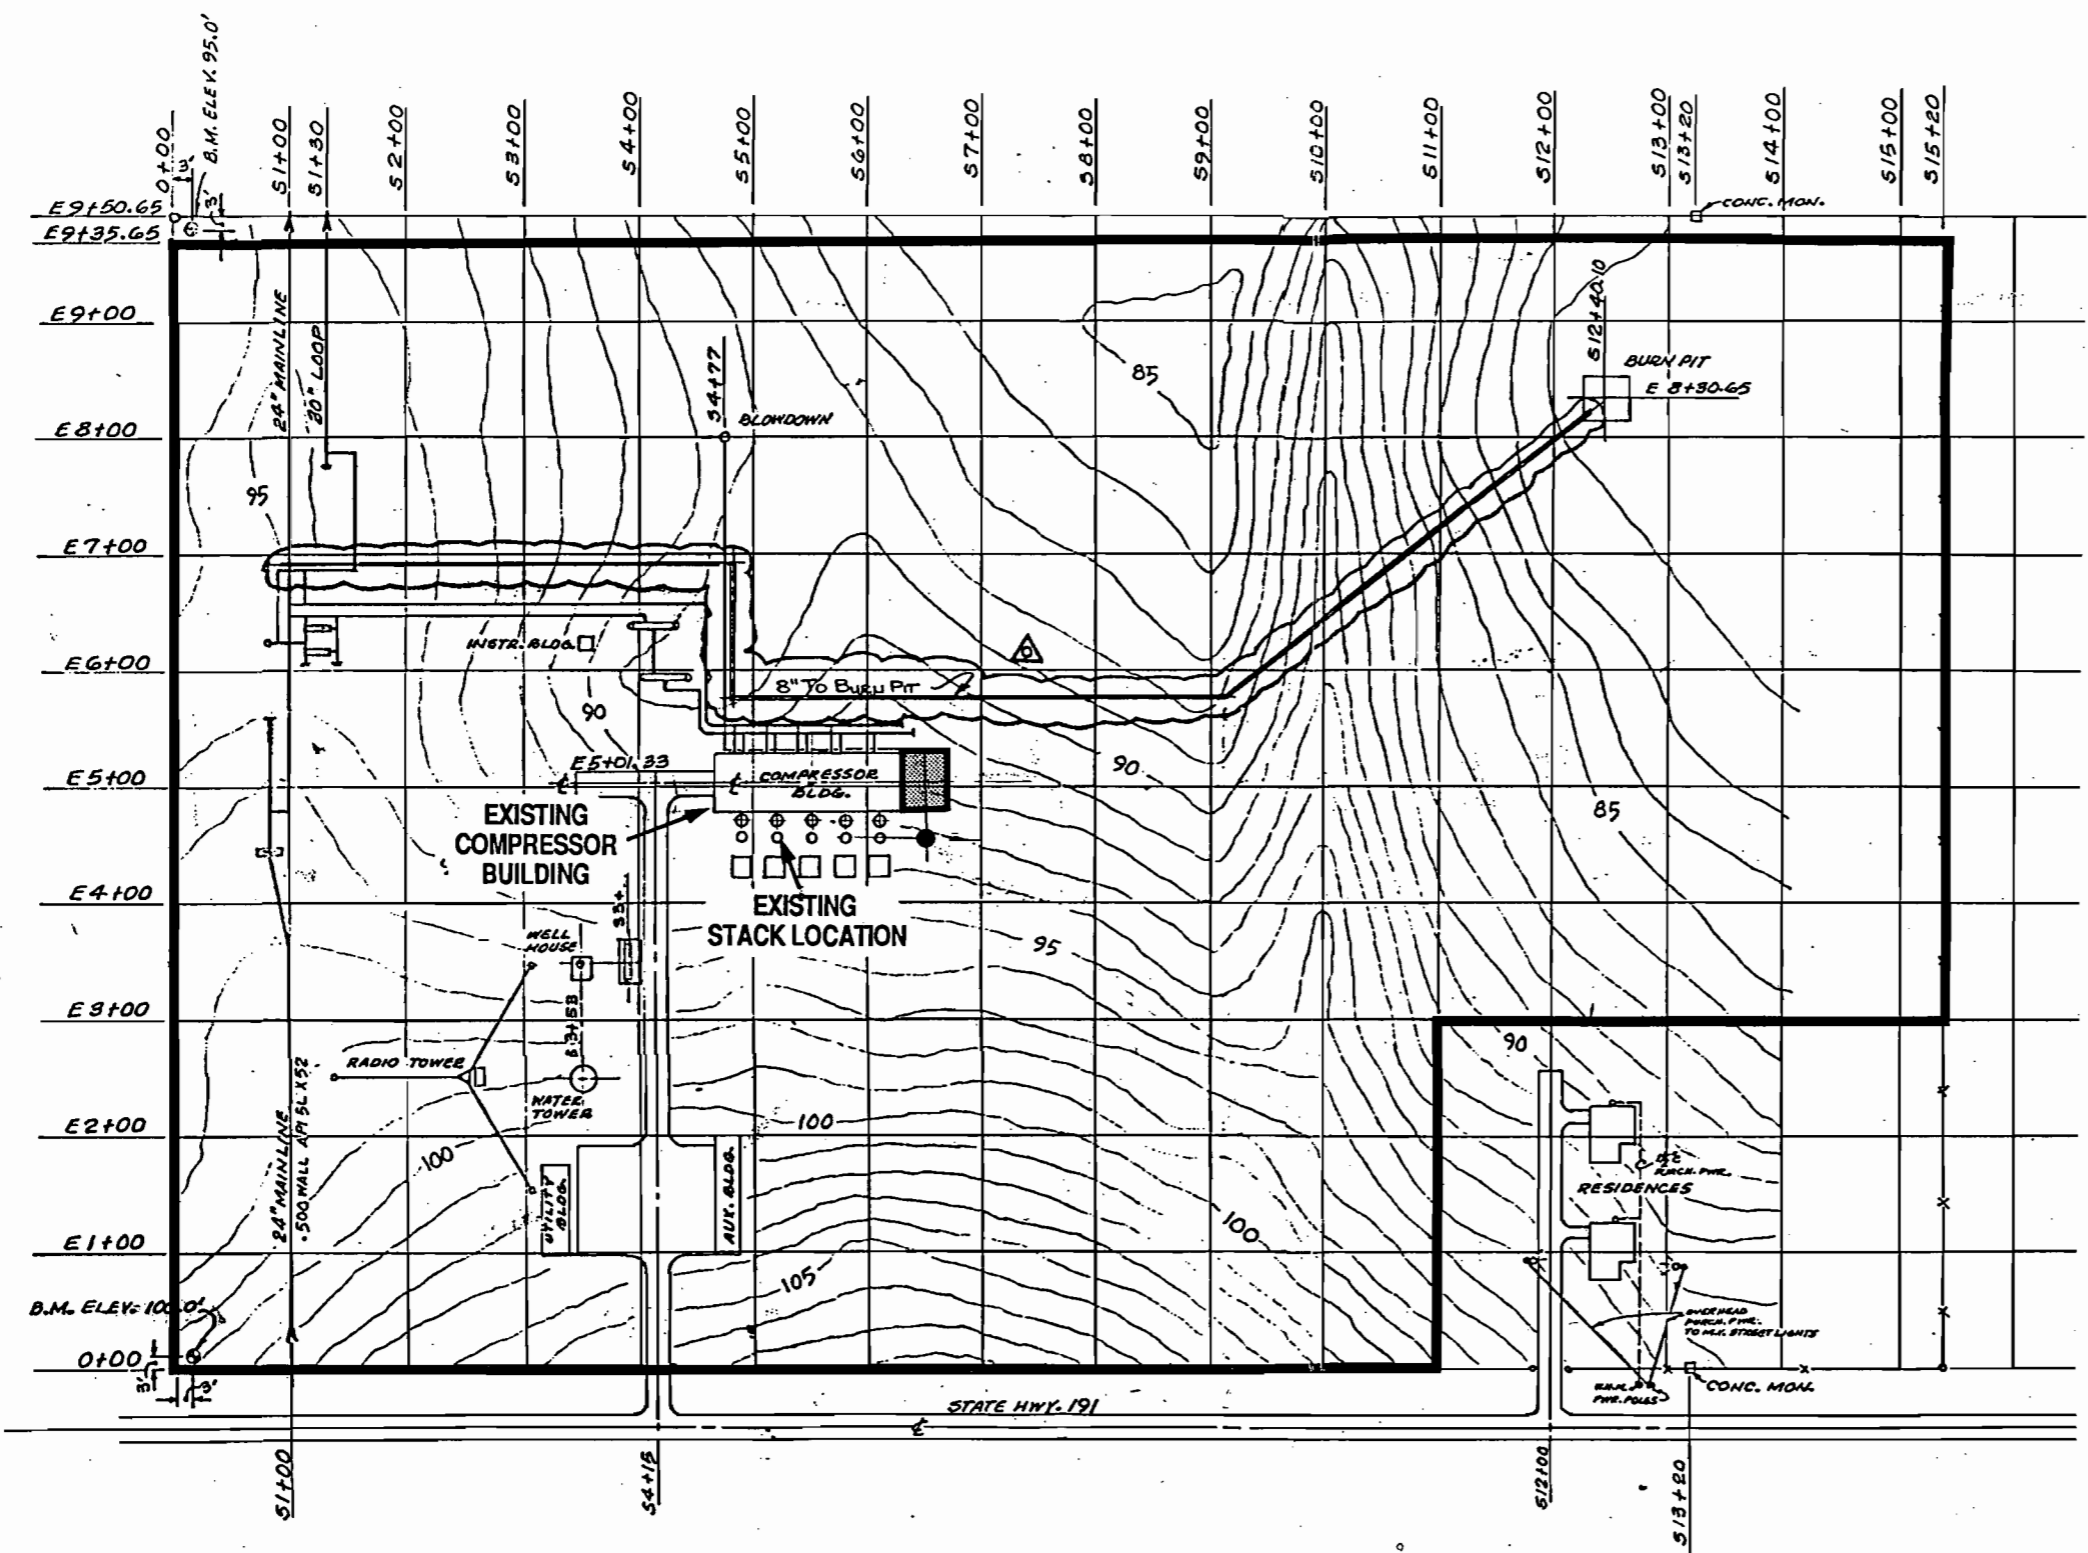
PLOT PLAN OF COMPRESSOR STATION NO. 12
